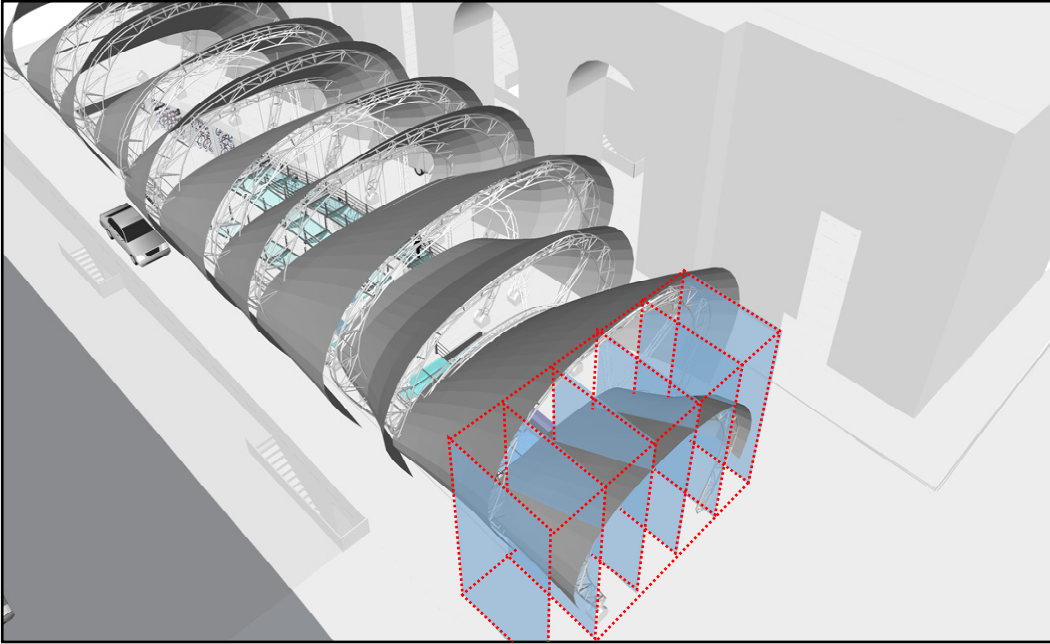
and 121. Union Station Bicycle Station Building Surface Fabrication and Assembly (Structure, Material, Fabrication, Assembly)
